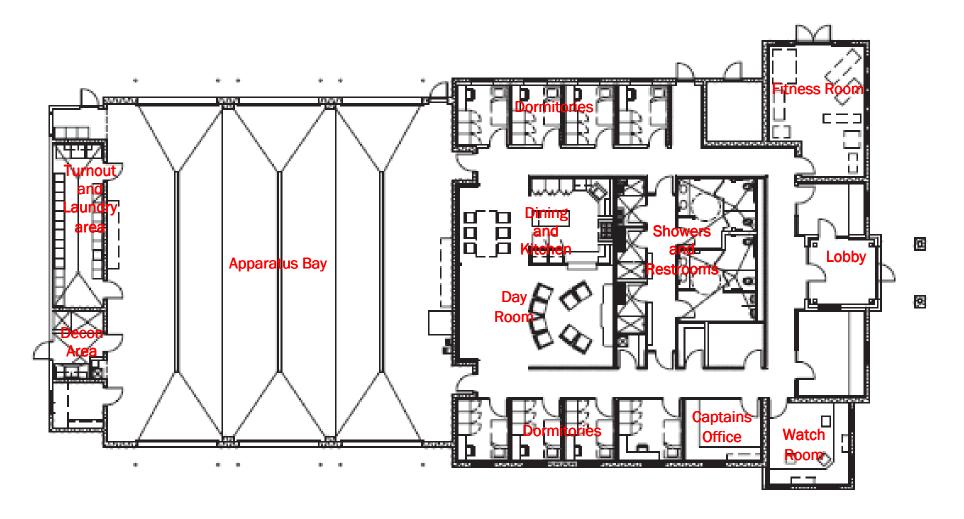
Commercial Three-Bay Fire Station Floor Plan Configuration
